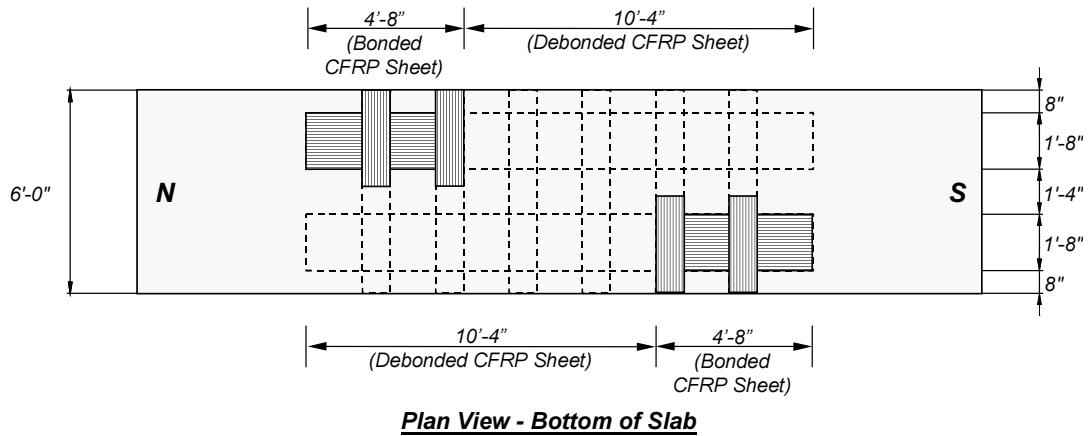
Bottom View of Specimen FS-2 Indicating the Extent of Debonding of CFRP Sheets
